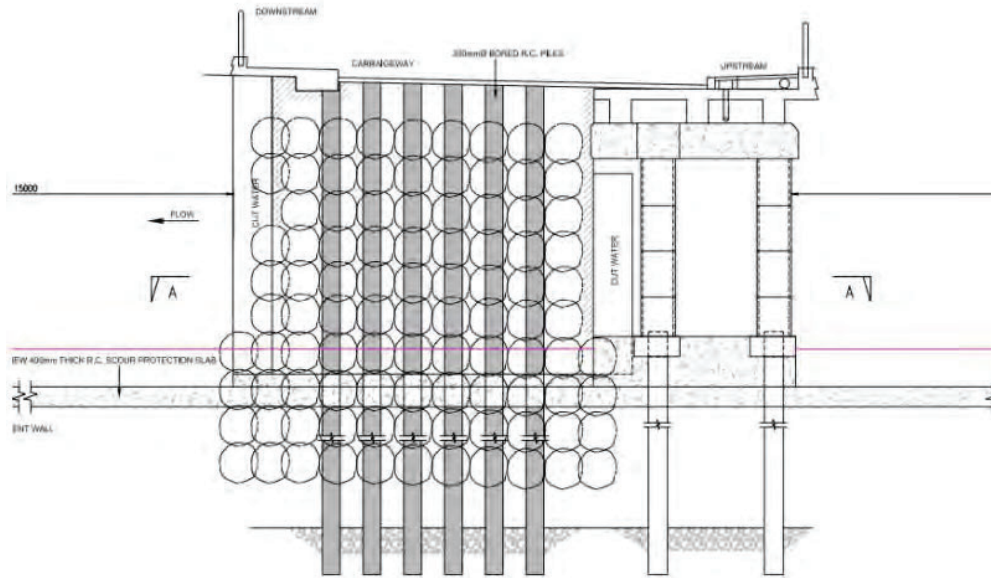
Mini-piles from bridge-deck Level (extracted from Drawing No. 1009) Not to scale.
